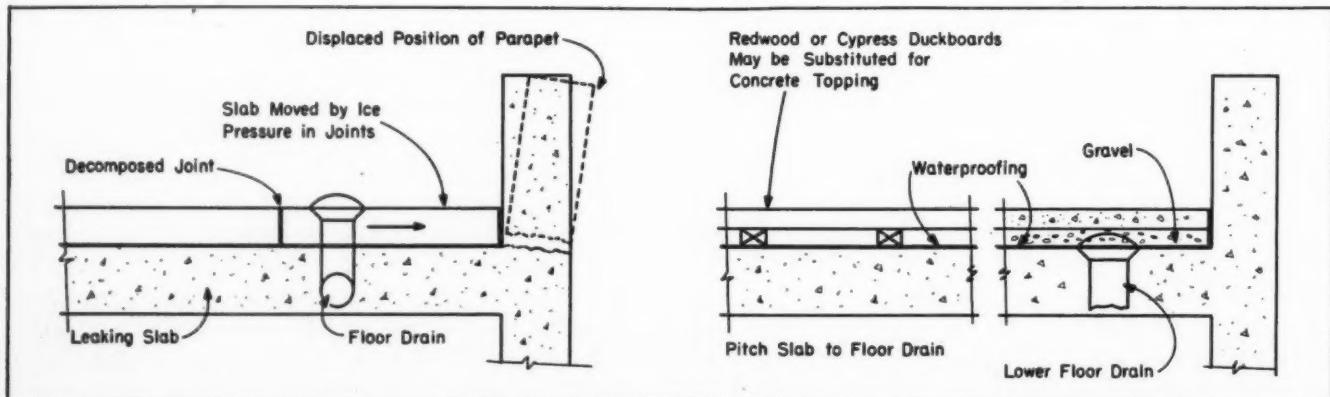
THE WRONG (LEFT) AND THE RIGHT WAY TO INSTALL FLOOR DRAINS IN CONCRETE STRUCTURAL SLABS.
